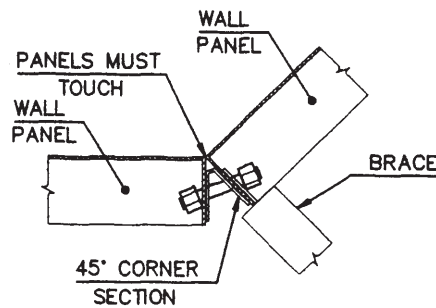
TYPICAL (45-DEGREE) CORNER ASSEMBLY
